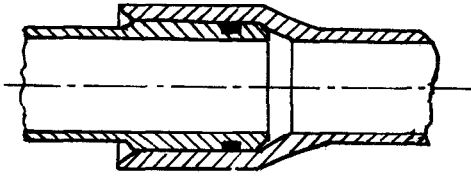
ILLUSTRATION OF SPIGOT AND SOCKET JOINT WITH SINGLE RUBBER GASKET
